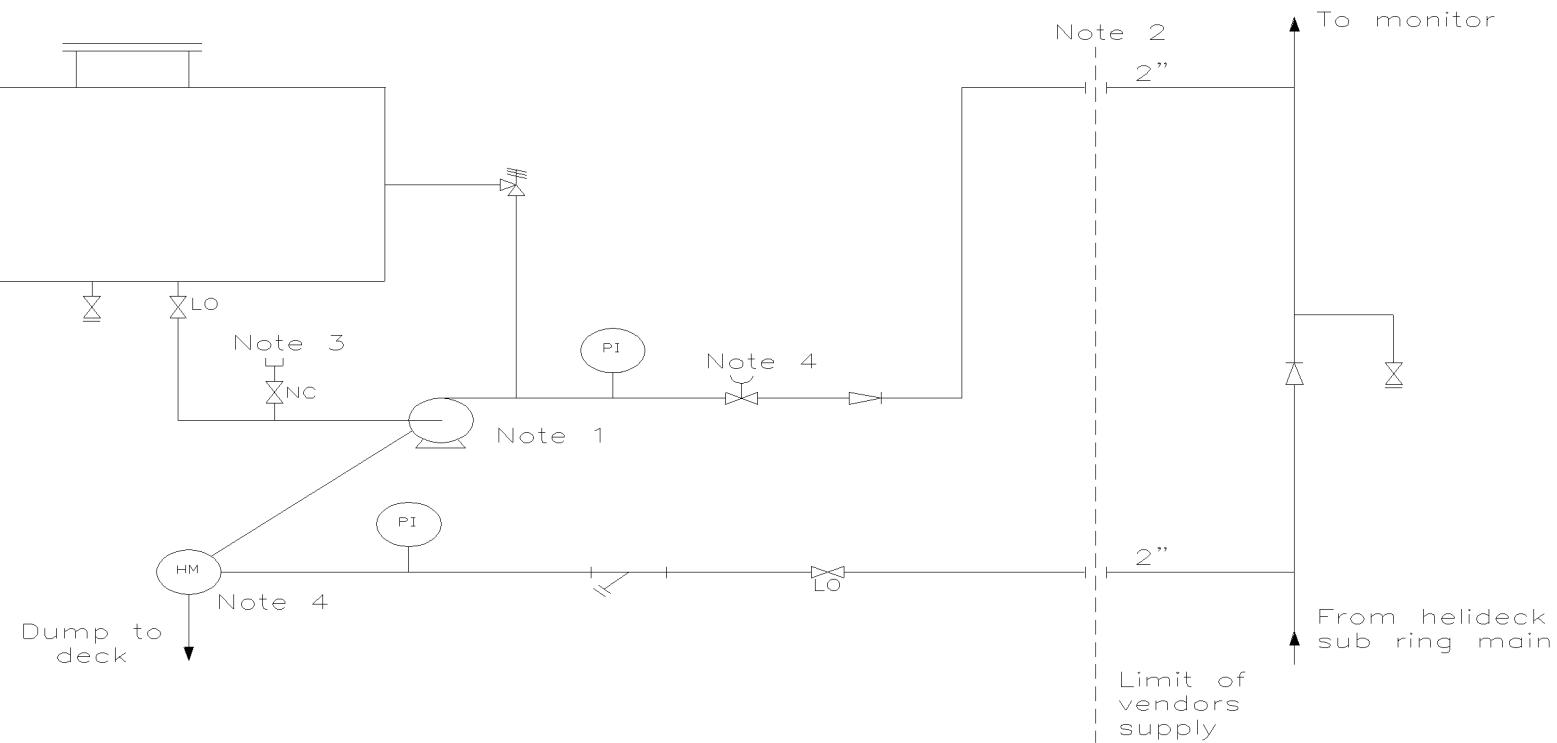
TYPICAL CENTRAL FOAM PROPORTIONING SCHEMATIC
